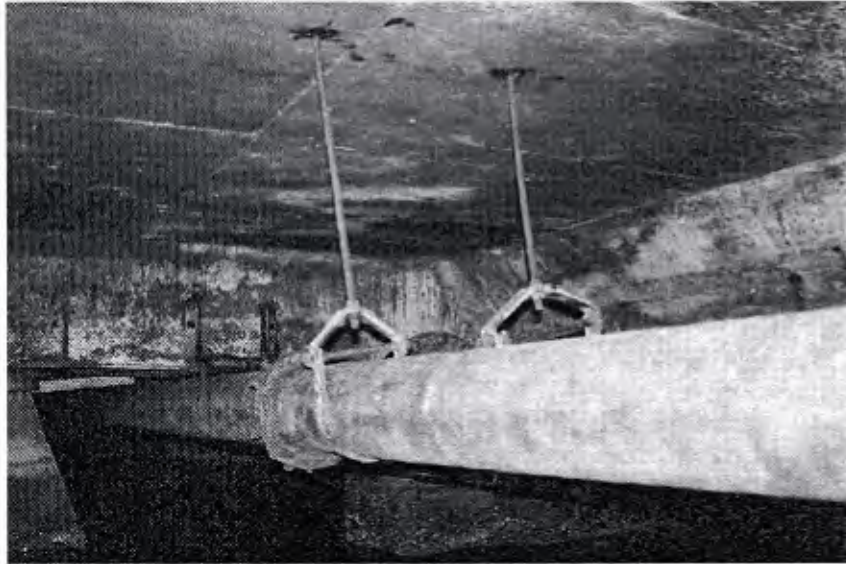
Under side of Pier 11 deck span 50-51 on the south side looking west.
